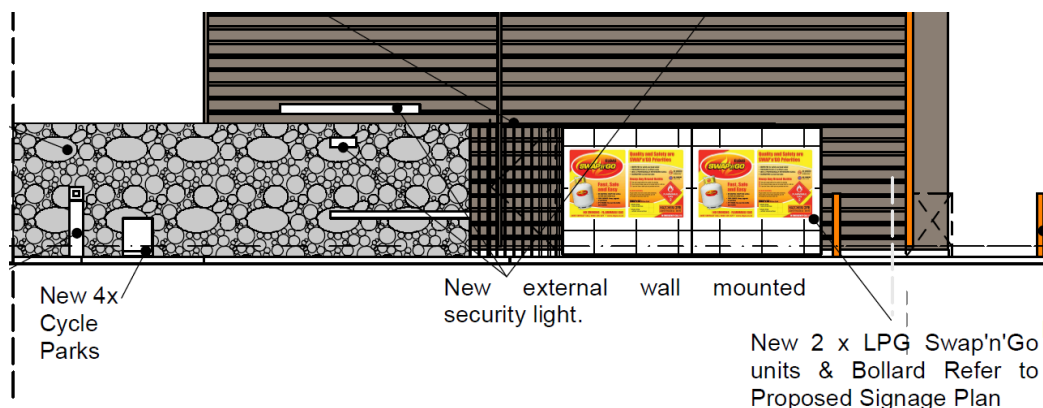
Exert of Drawing Z\_PS\_A09 – Proposed External Elevations – Stone Wall, Seating Area and ‘Swap N Go’ Cage along Southern Elevation of Retail Store
